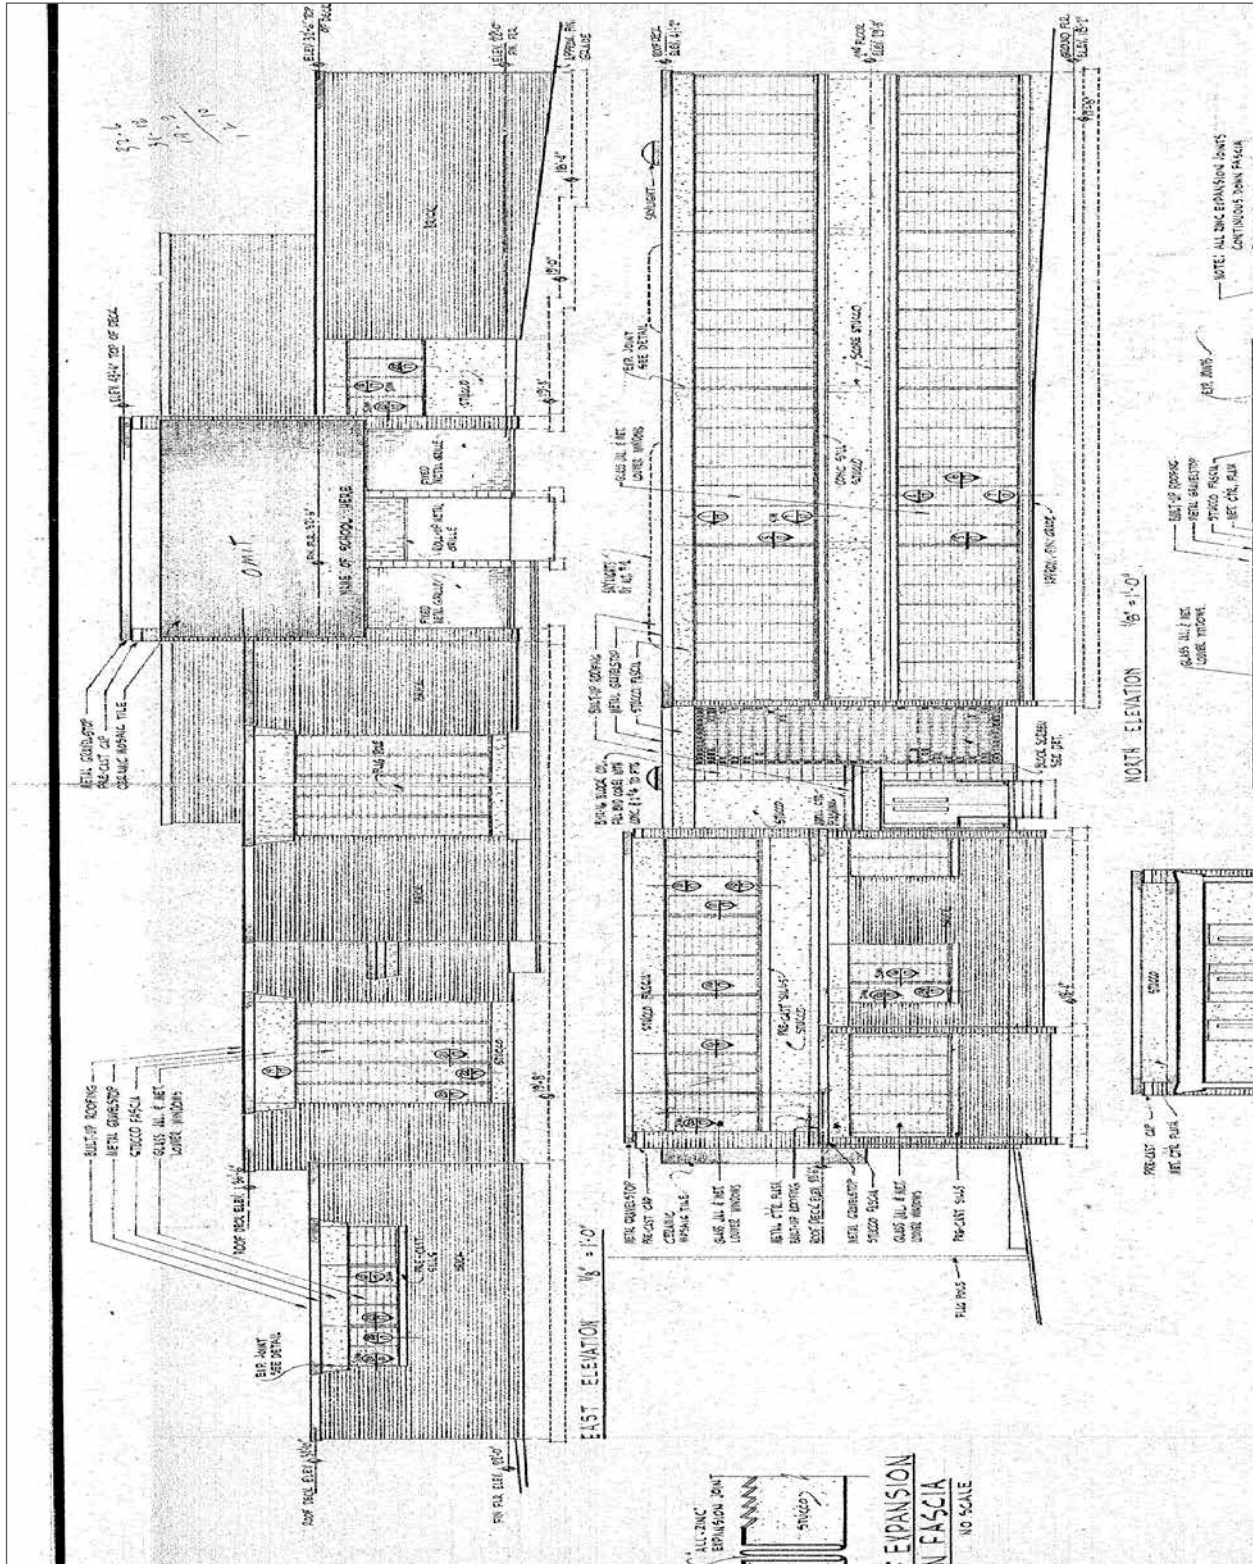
Detail of 1961 architectural plans page A3, showing east and north elevation footing elevation
